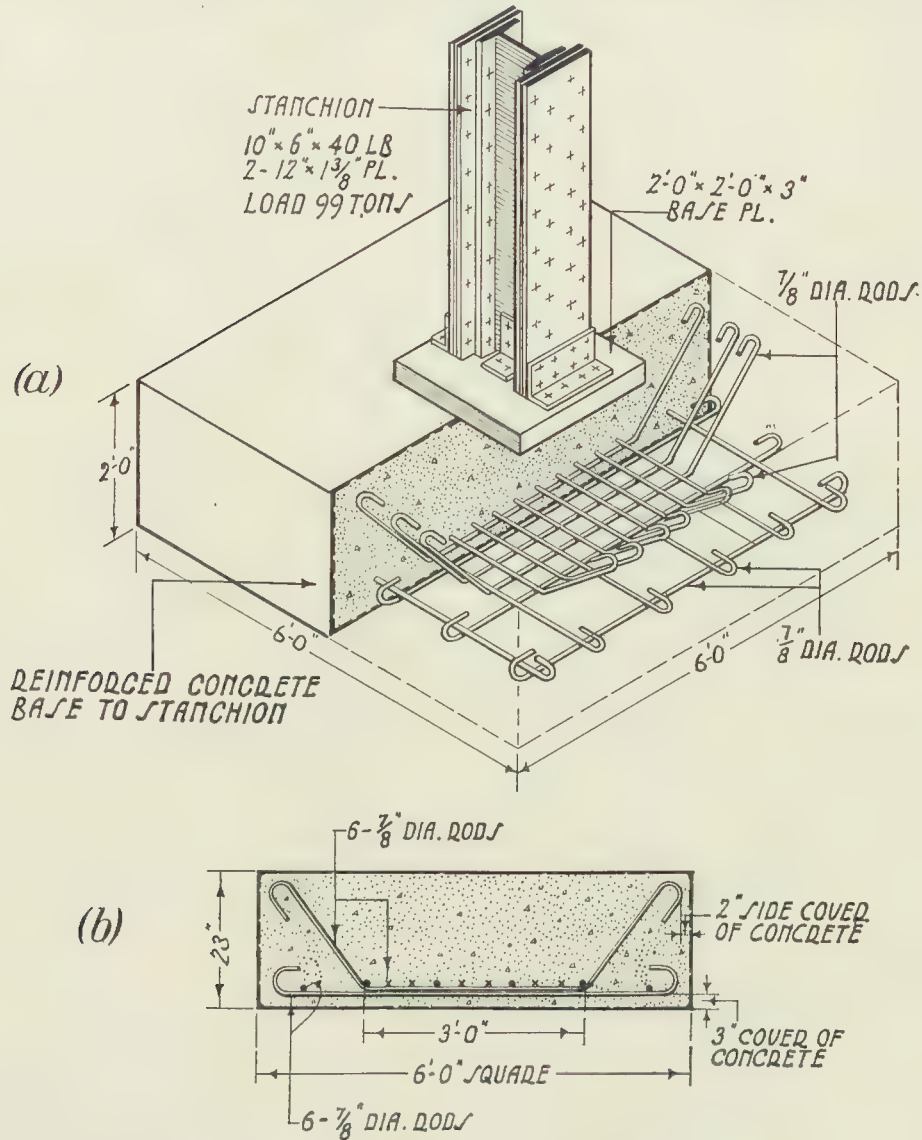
REINFORCED CONCRETE PIER FOUNDATIONS
